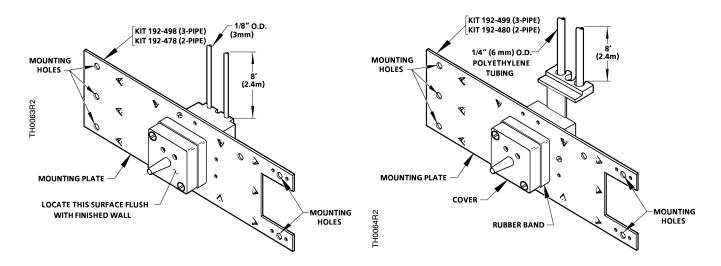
In Plaster Walls Use Wall Box Kit 192-478 or 192-480 as Shown.
